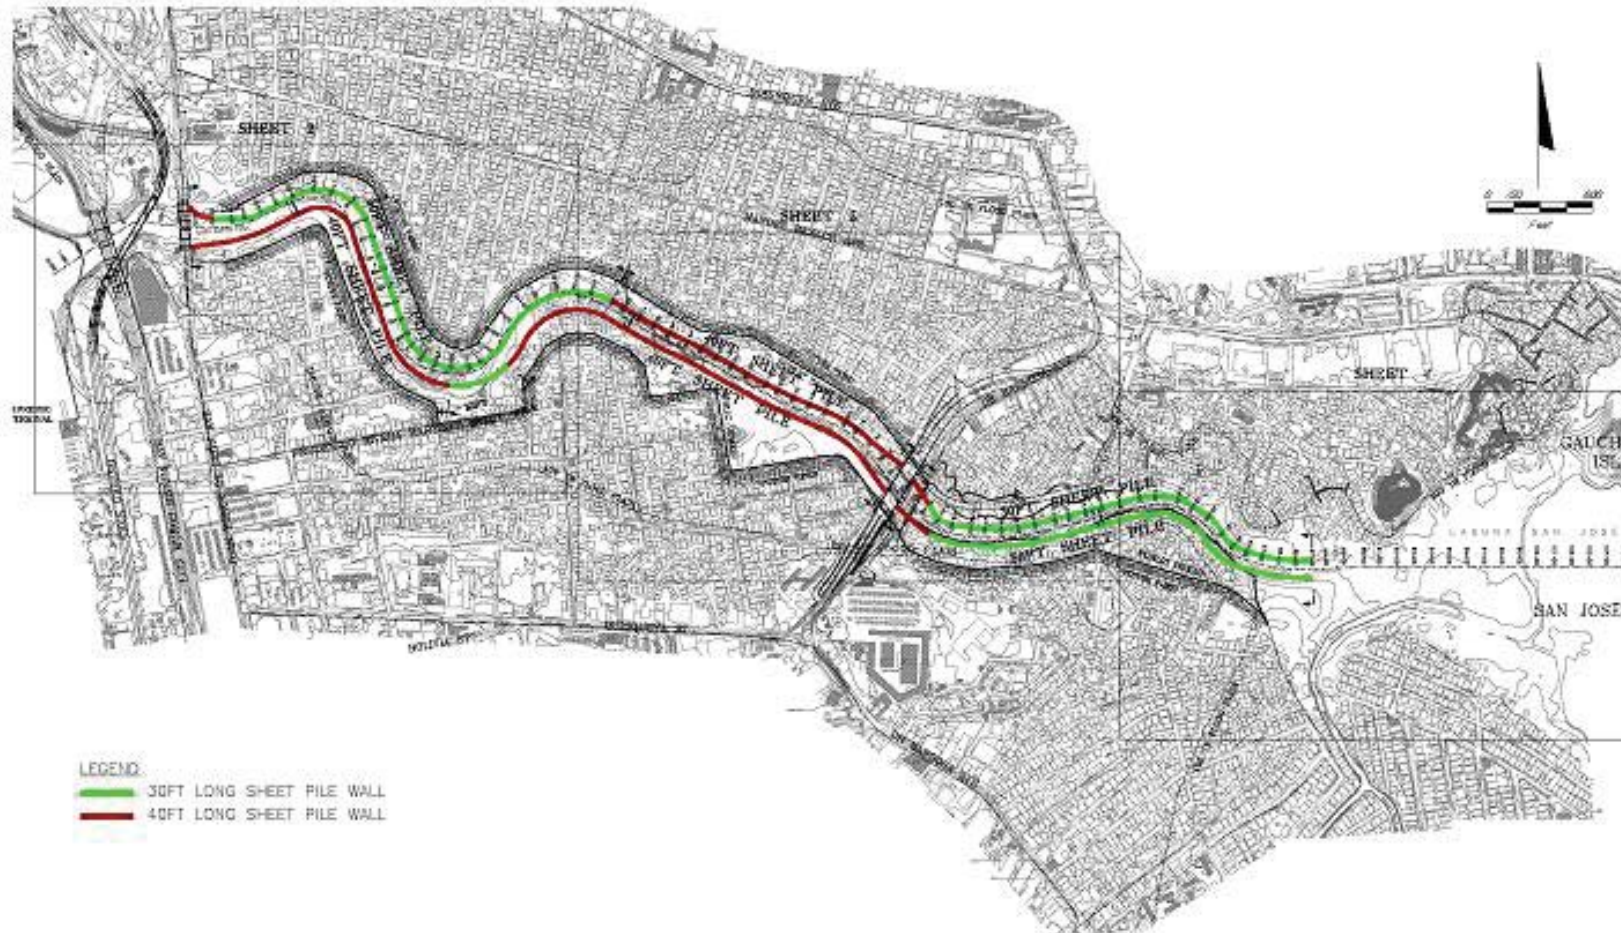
Sheet Pile Wall Layout, 15-foot-deep Channel
